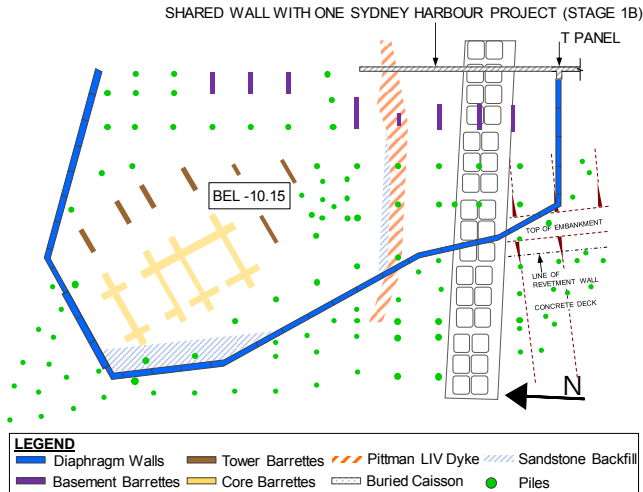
Crown Sydney Hotel Resort basement foundation plan
